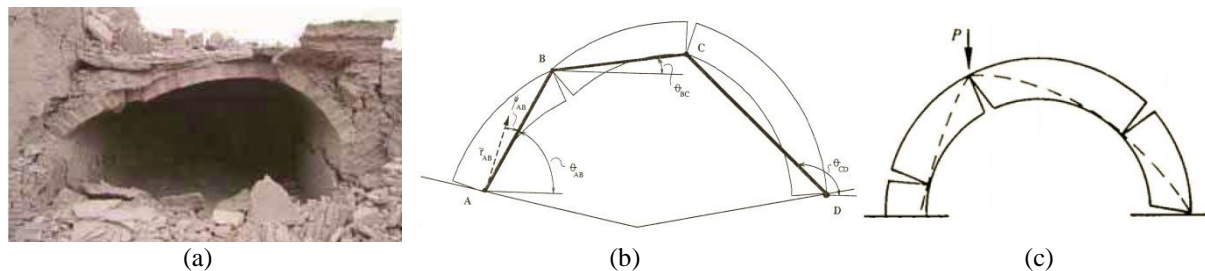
Failure mechanism of vaults: (a) adobe vault after Bam earthquake (2003); (b) masonry vault under seismic load [38]; (c) masonry vault subjected to a concentrated load at quarter-span.
